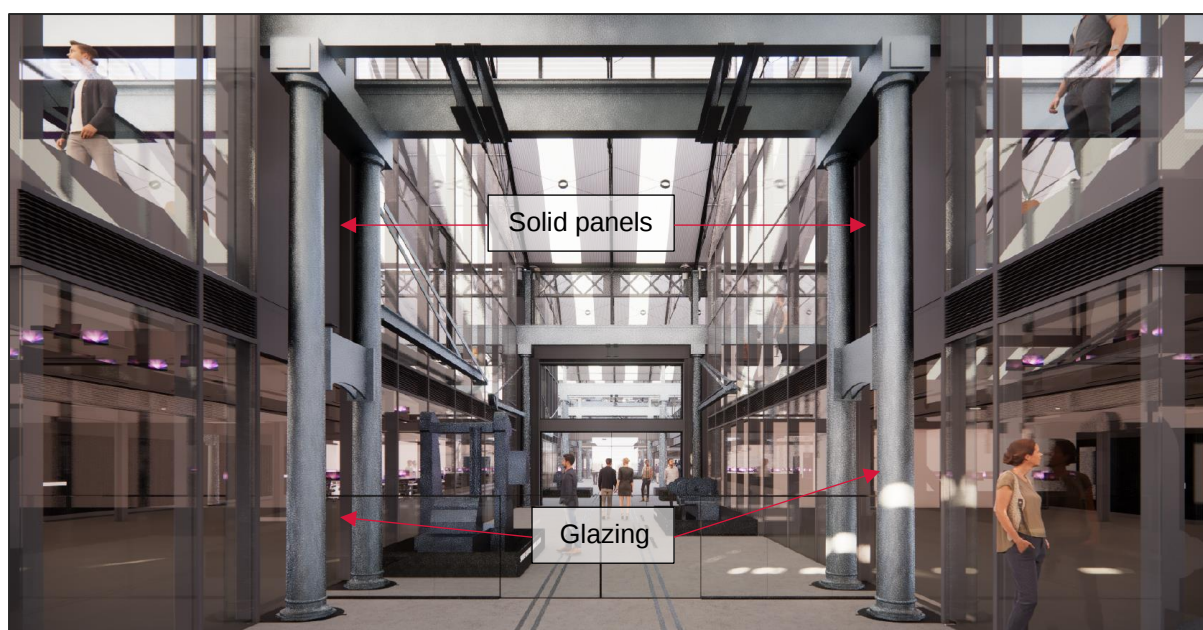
| Proposed full height glazing, with solid elements removed at ground floor (Source: Applicant's RRFI)
